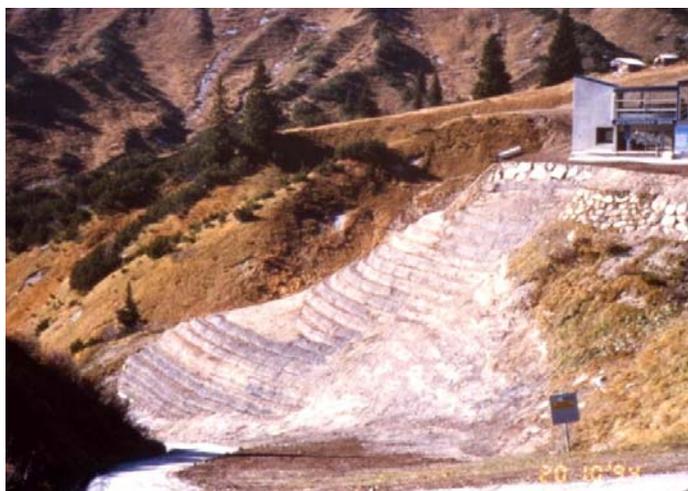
Steinmaderer Wand: slope reconstruction just after completion (1994)
